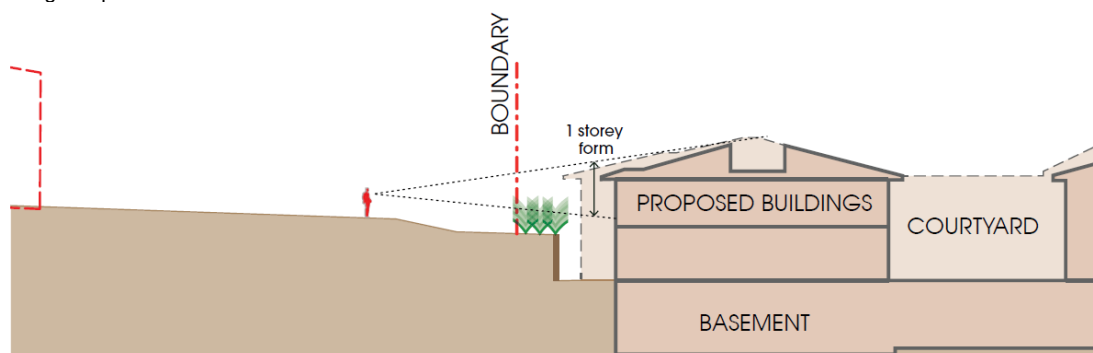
Side (South East) Elevation and with existing and proposed planting. Source-Group GSA
